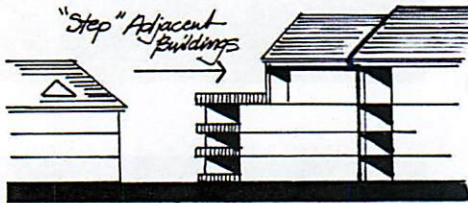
and b: Illustrations demonstrate a transition in height from multi-storey building to lower adjoining building and the perceived reduction in massing due to highly articulated facades and varied roof lines.
